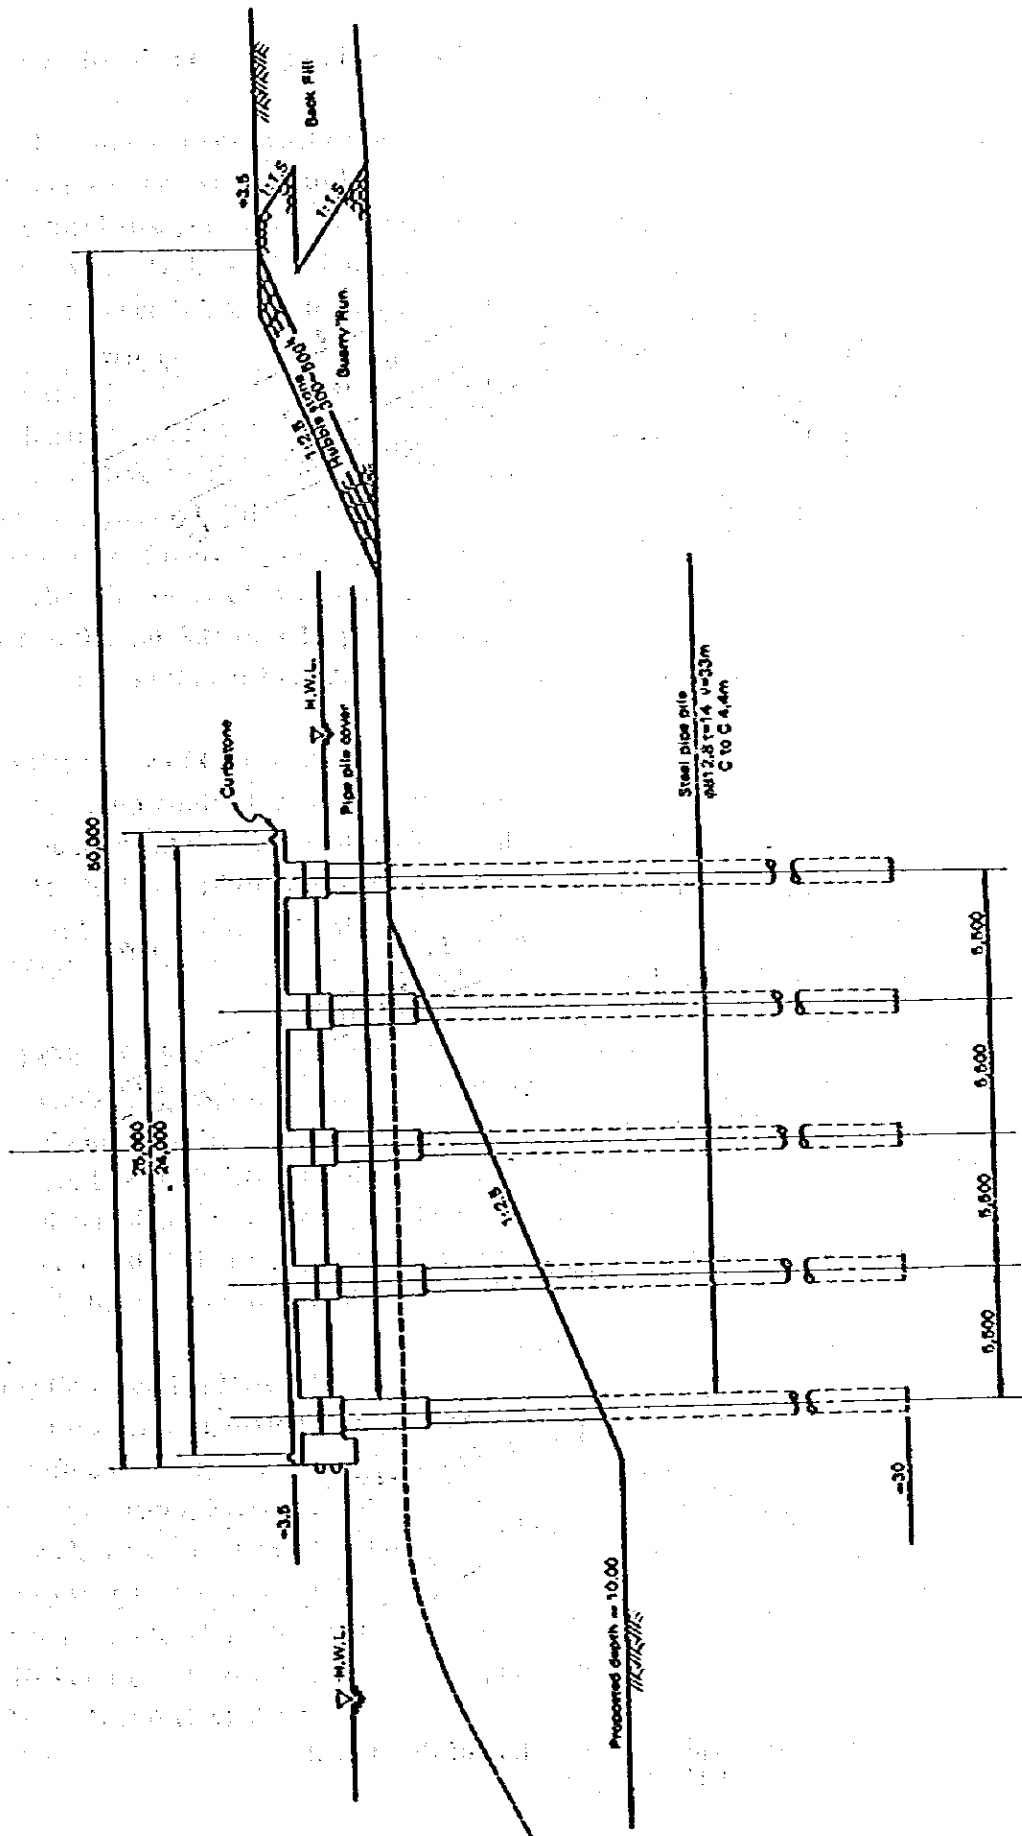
Typical Cross Section of Berth (T-Head Type)
